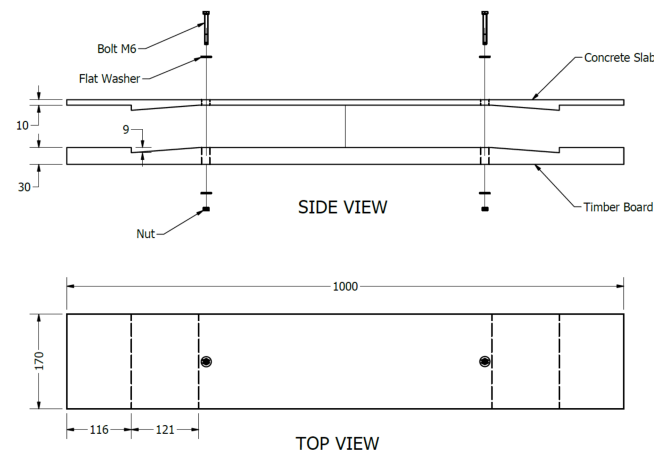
Conceptual design of the novel demountable timber–concrete composite floor system.
